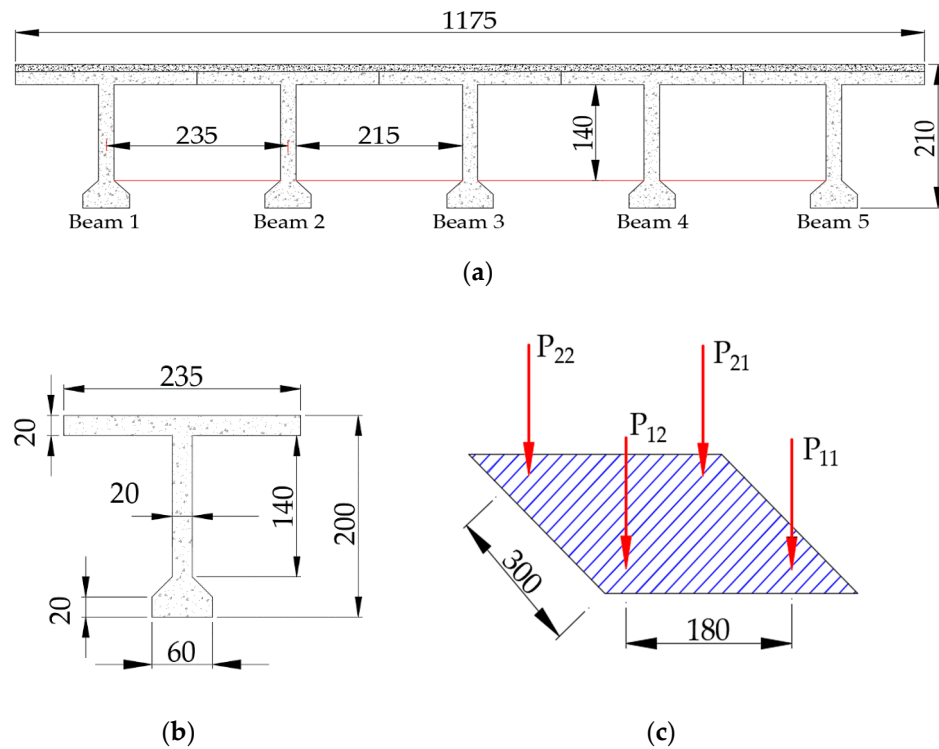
(a) Bridge model, (b) bridge section size, (c) vehicle load (unit: mm).
